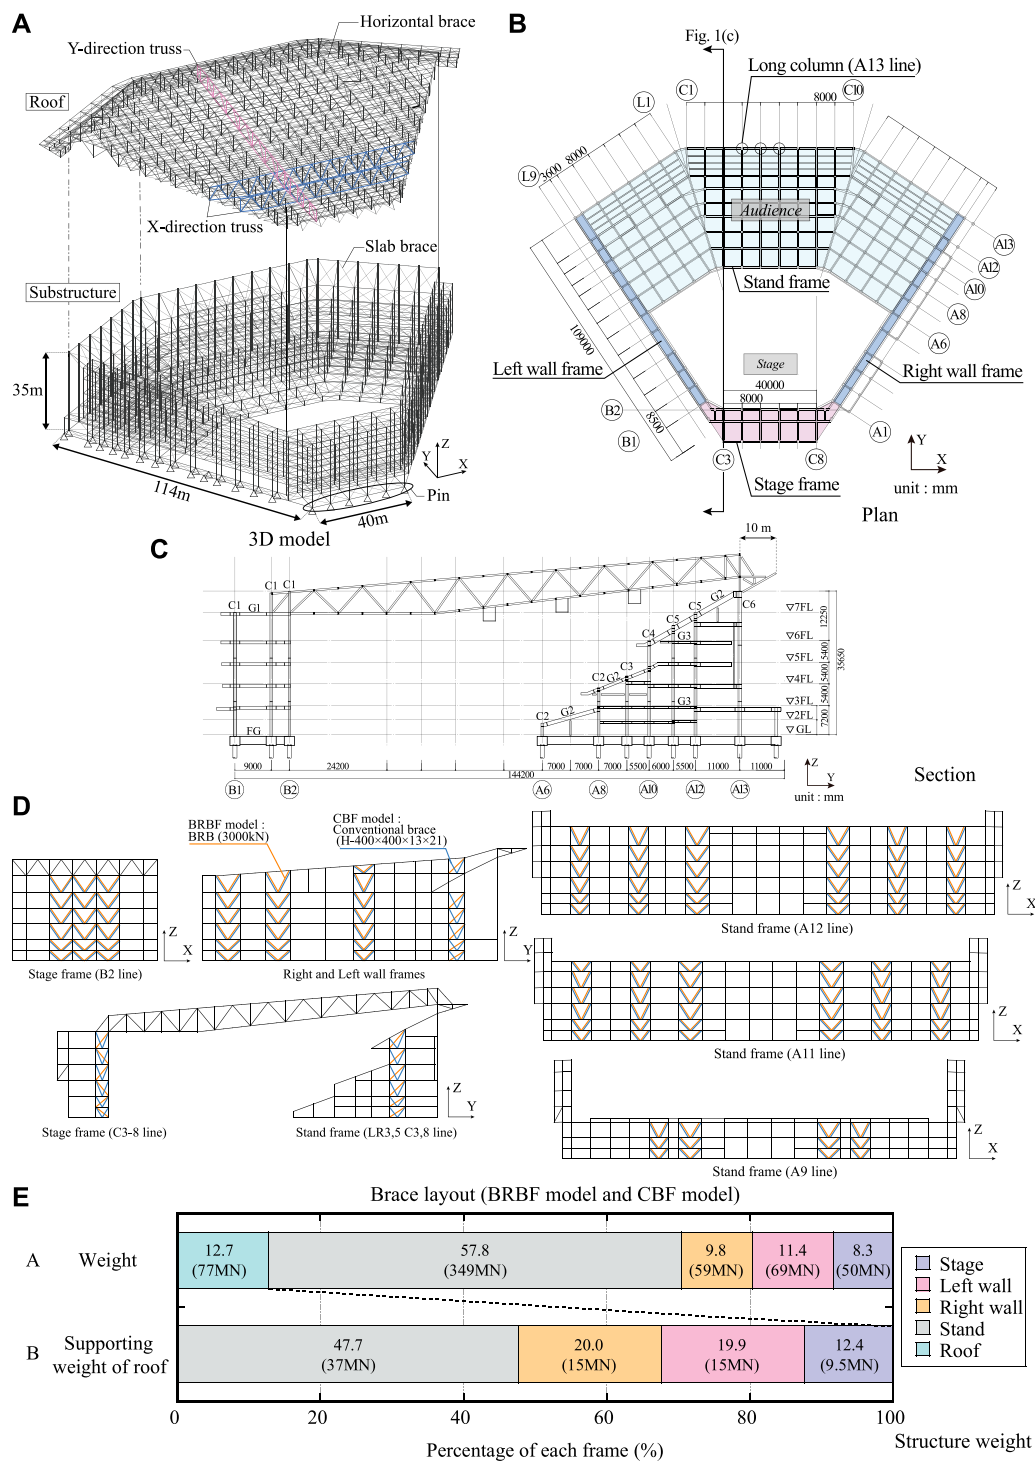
| Building specifications: (A) 3D model, (B) Plan, (C) Section, (D) Brace Layout (BRBF model and CBF model), (E) Structure weight.
